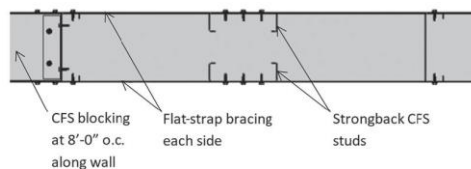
CFS stud-wall flat-strap bracing and blocking—strongback anchorage (plan view)
